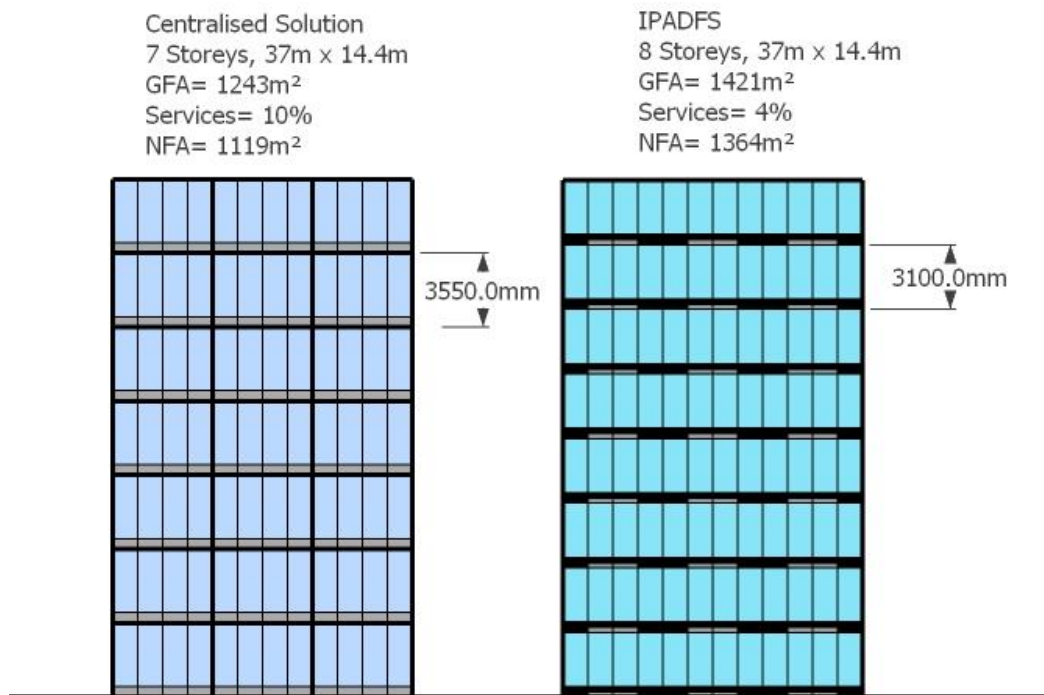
Facade and floor area differences between a standard solution and the IPADFS
